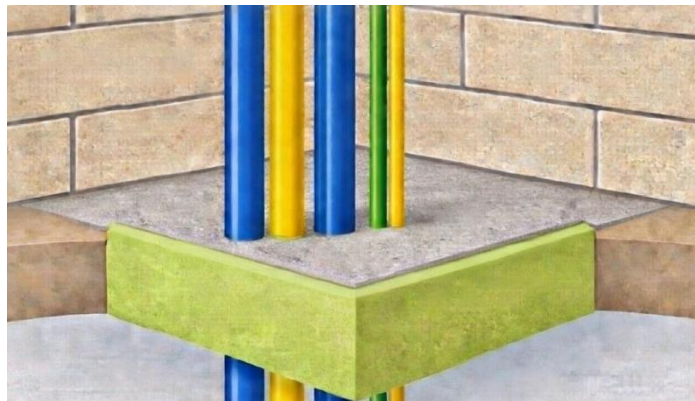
Vertical service riser shaft with non-load-bearing fireproofing and concrete screed.
